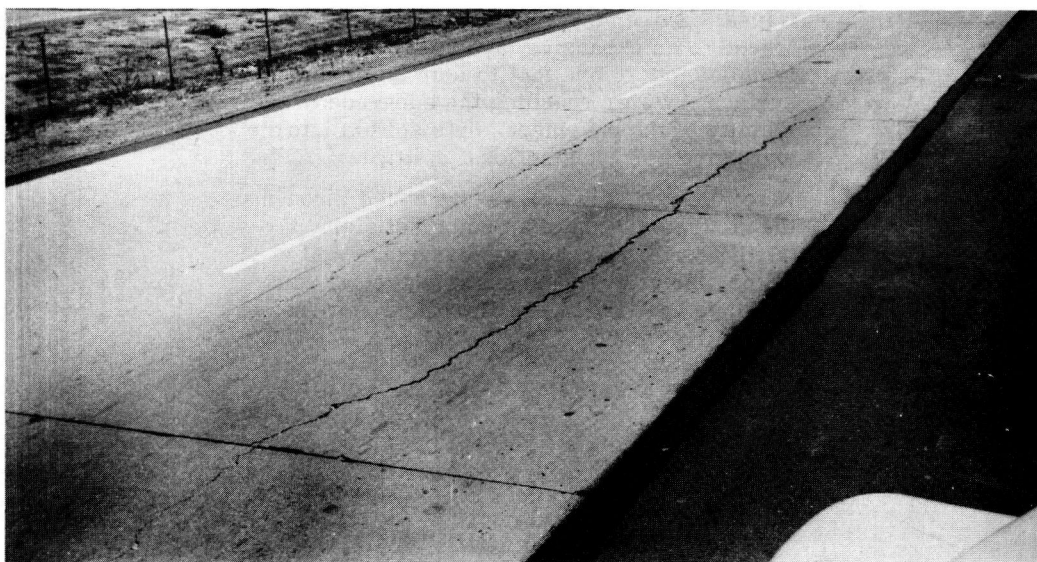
Distress and serious breakup of an airfield pavement used as a test track.
